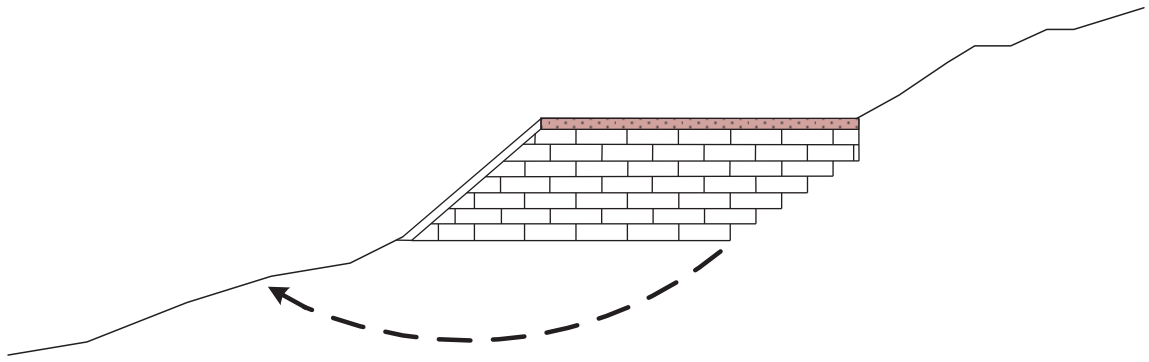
Bearing capacity failure of the embankment due to general shear failure or local shear failure.
